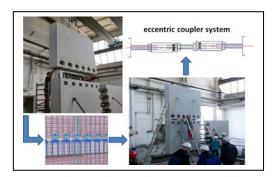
state of the art wall construction with precast concrete elements and use of eccentric coupler system [11] for the connection of elements
